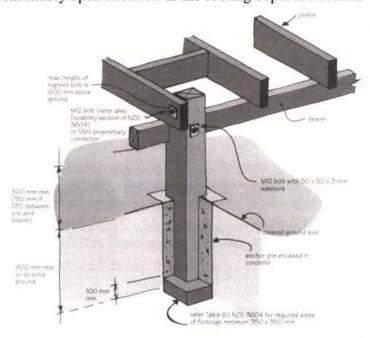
Anchor Pile Solution (Source: BRANZ 2000)
